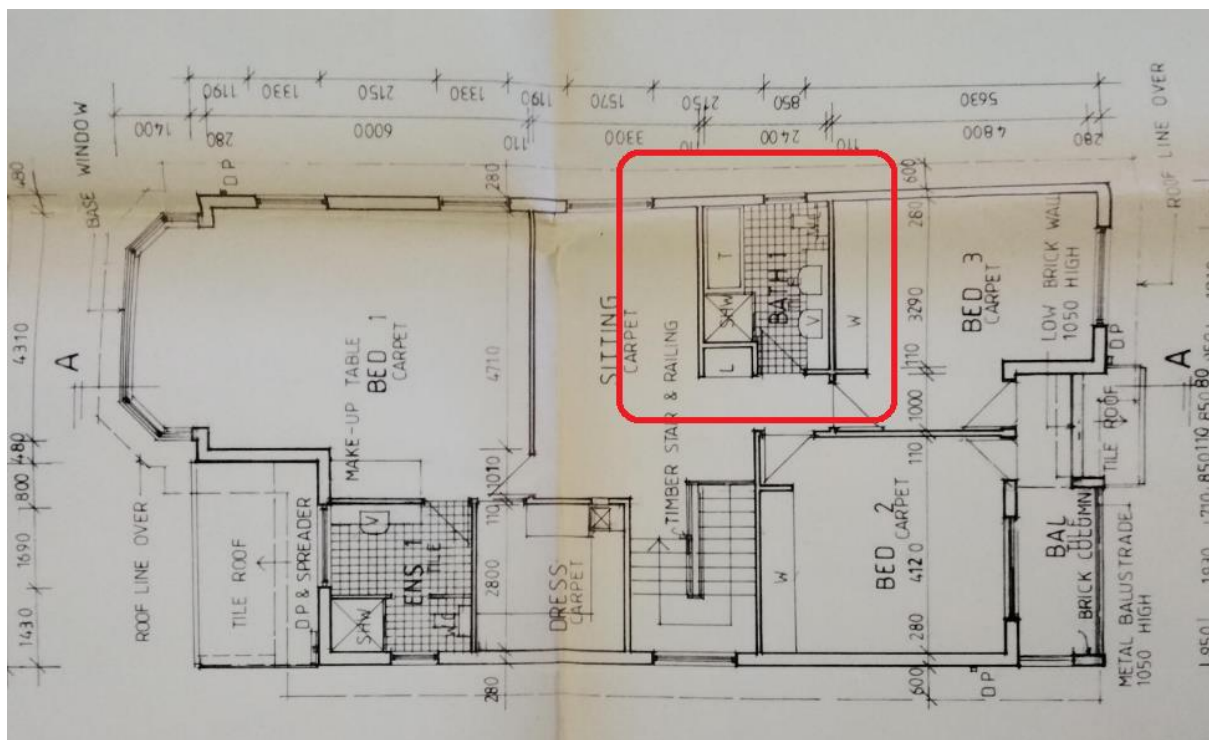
Extract of the floor plan approved in BA256.91 with the separate bathroom outlined.
